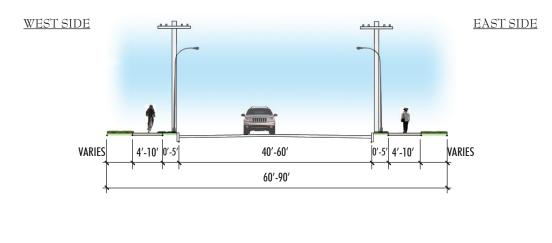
The Hub: Zone 9 Existing Conditions Section and Plan
